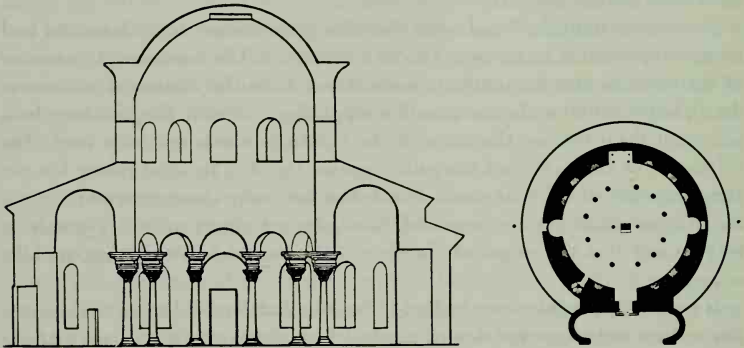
Plan and cross section of a typical Early Christian church of the central type.
